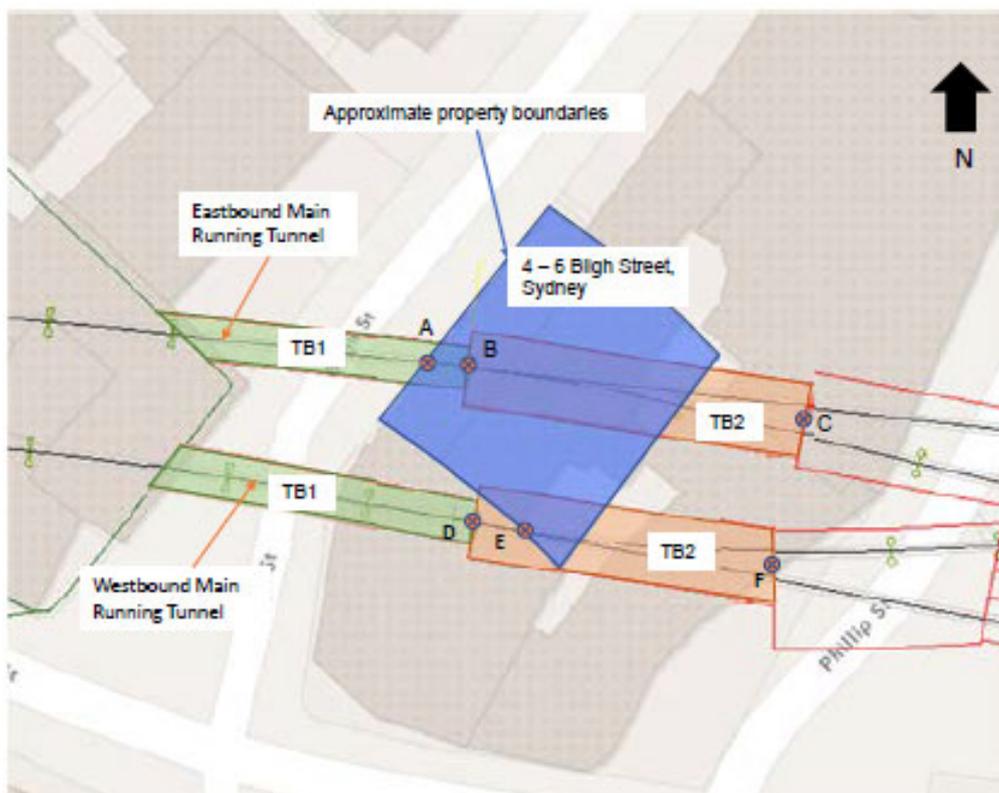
Location of Sydney Metro West Tunnels – Eastbound and Westbound Tunnels (extracted from Sketchbook by WB)
